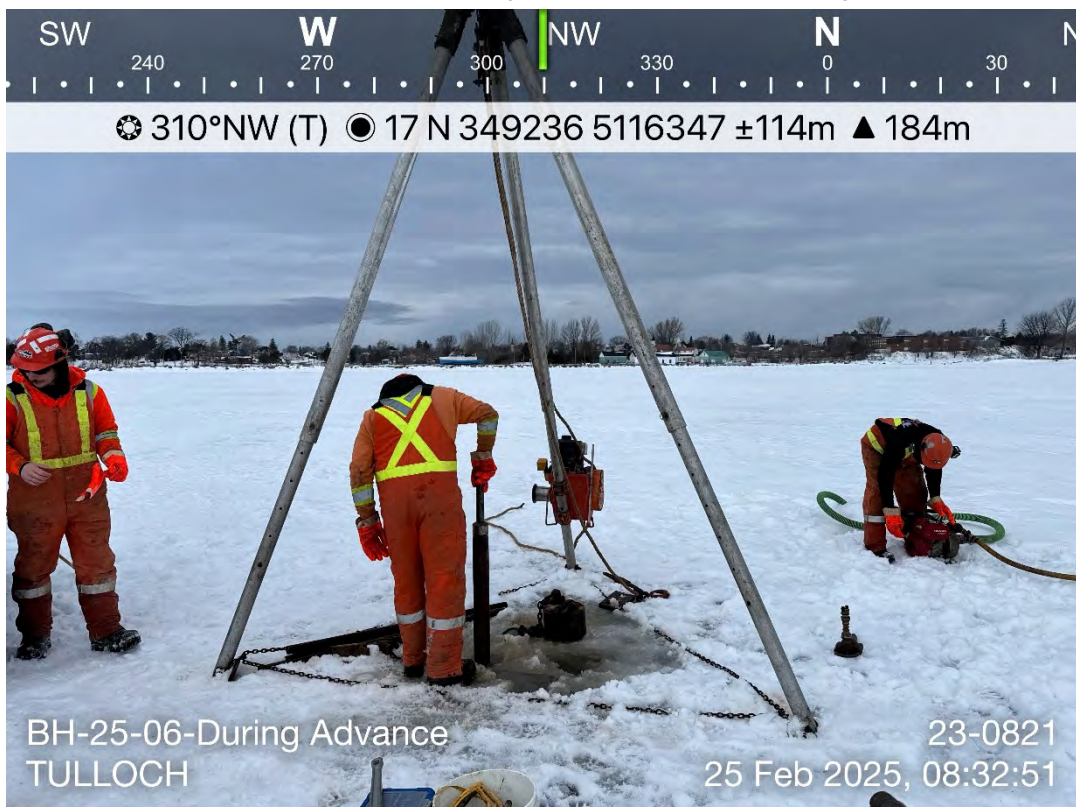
BH-25-06-705 during advancement. Photo taken facing northwest.
